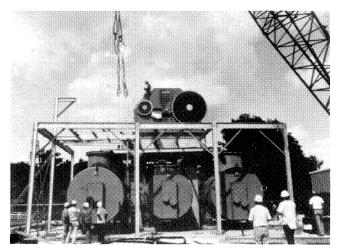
Four-stage Integrally Geared Centrifugal Compressor in an American Air Separation Plant; $V_c = 240,000 \text{ m}^3/h$; $P_c = 19,000 \text{ kW}$.
